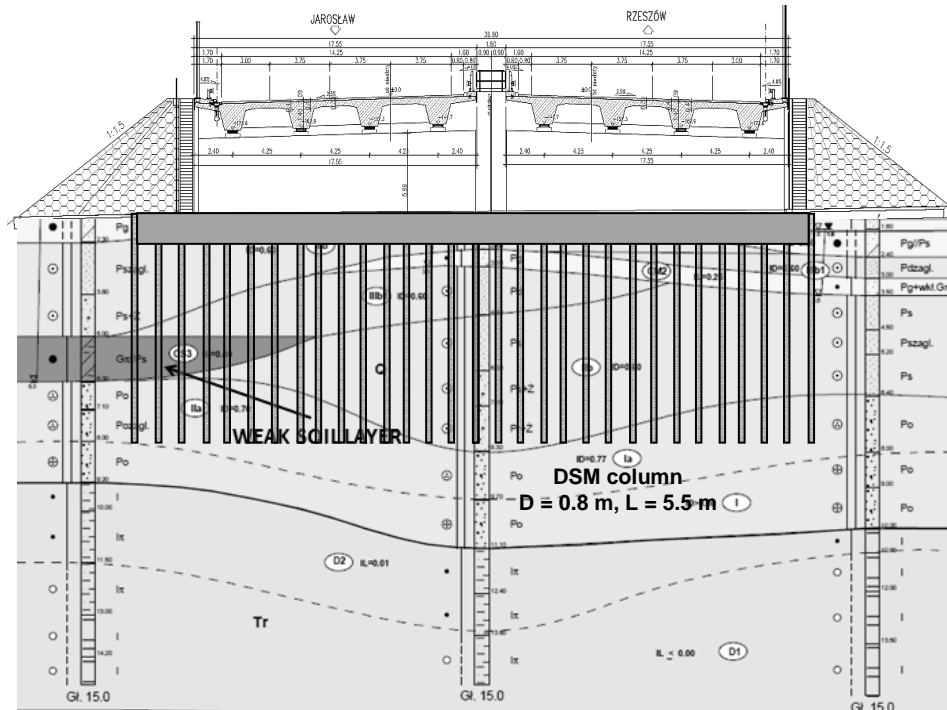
Cross section of the viaduct and view the abutment A with an indication weak soil layer on geotechnical profile
